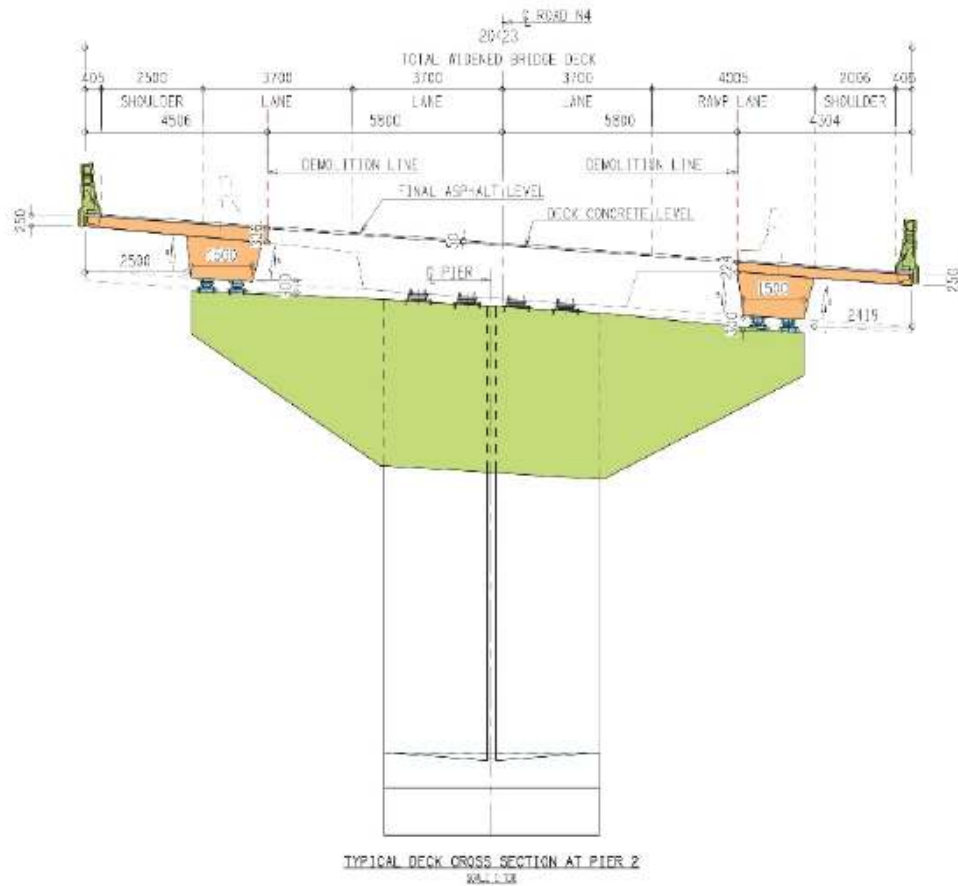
Typical Alternative 2 sub-structure at Pier 2
